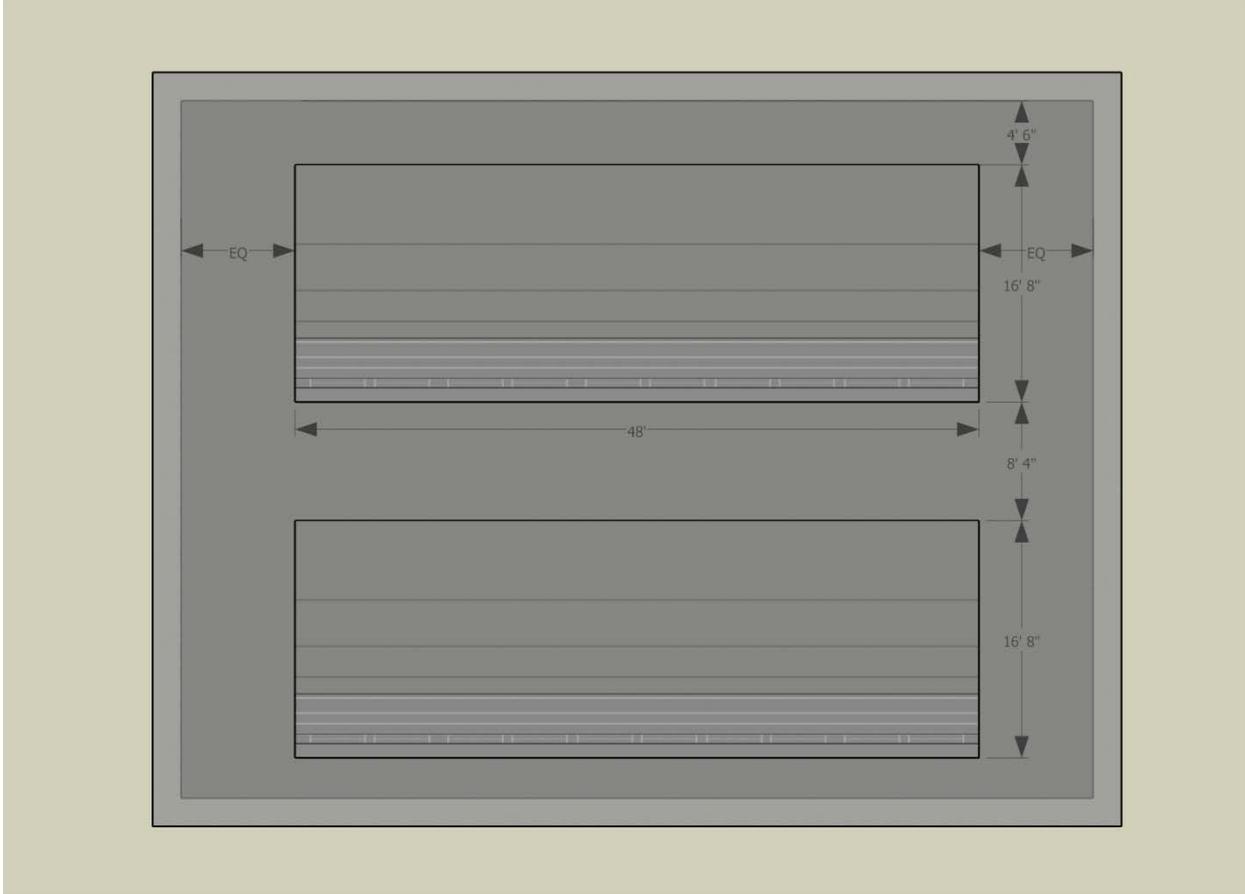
Gym with south-facing roof monitors – reflected ceiling plan
